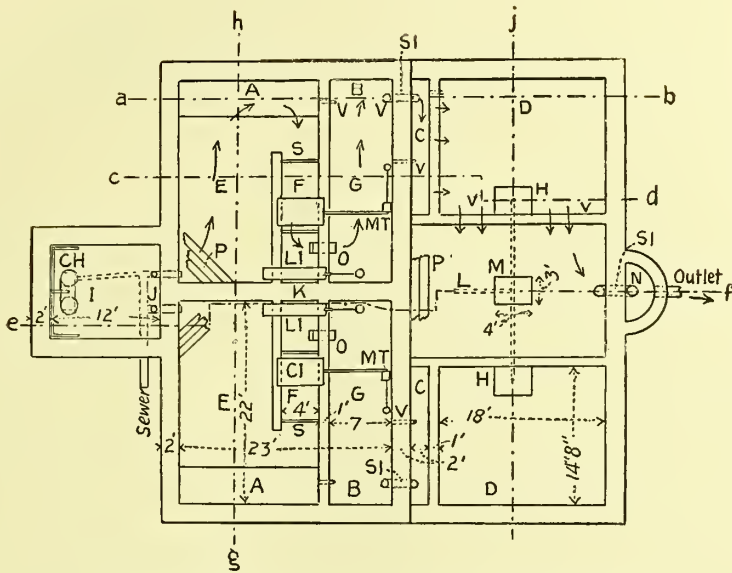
SECTIONAL PLAN OF ROUND LAKE WORKS.
